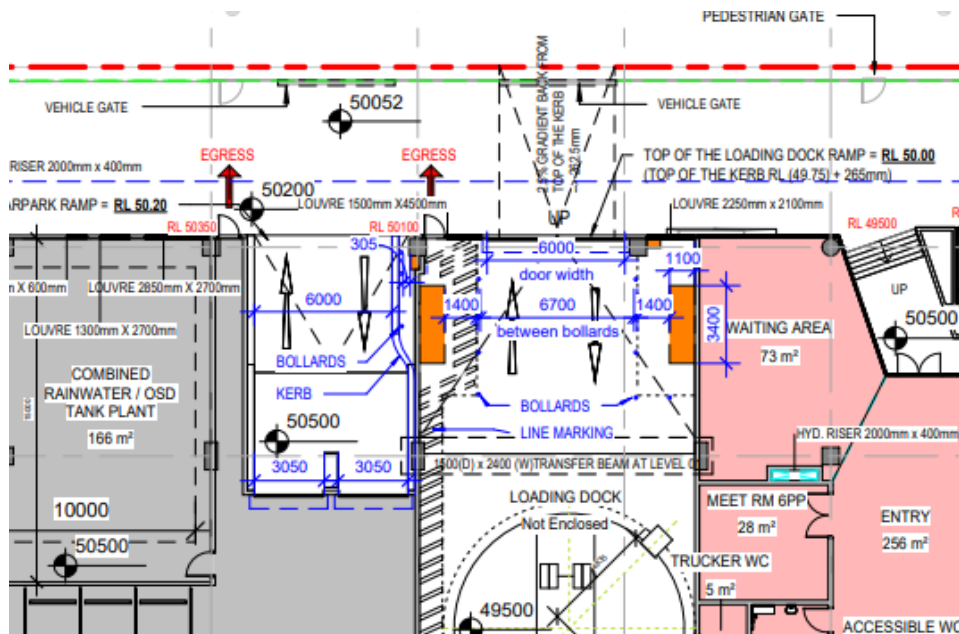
Extract from Ground floor Plan (Source: Greenbox Architecture)
